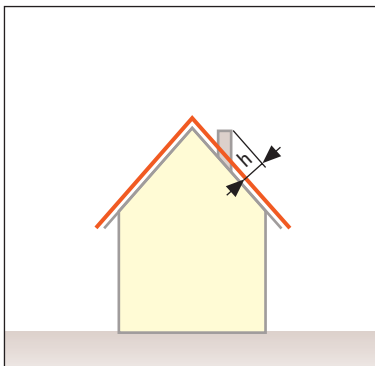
Height of a roof superstructure made of electrically non-conductive material (e.g. PVC), $h \leq 0.5$ m
